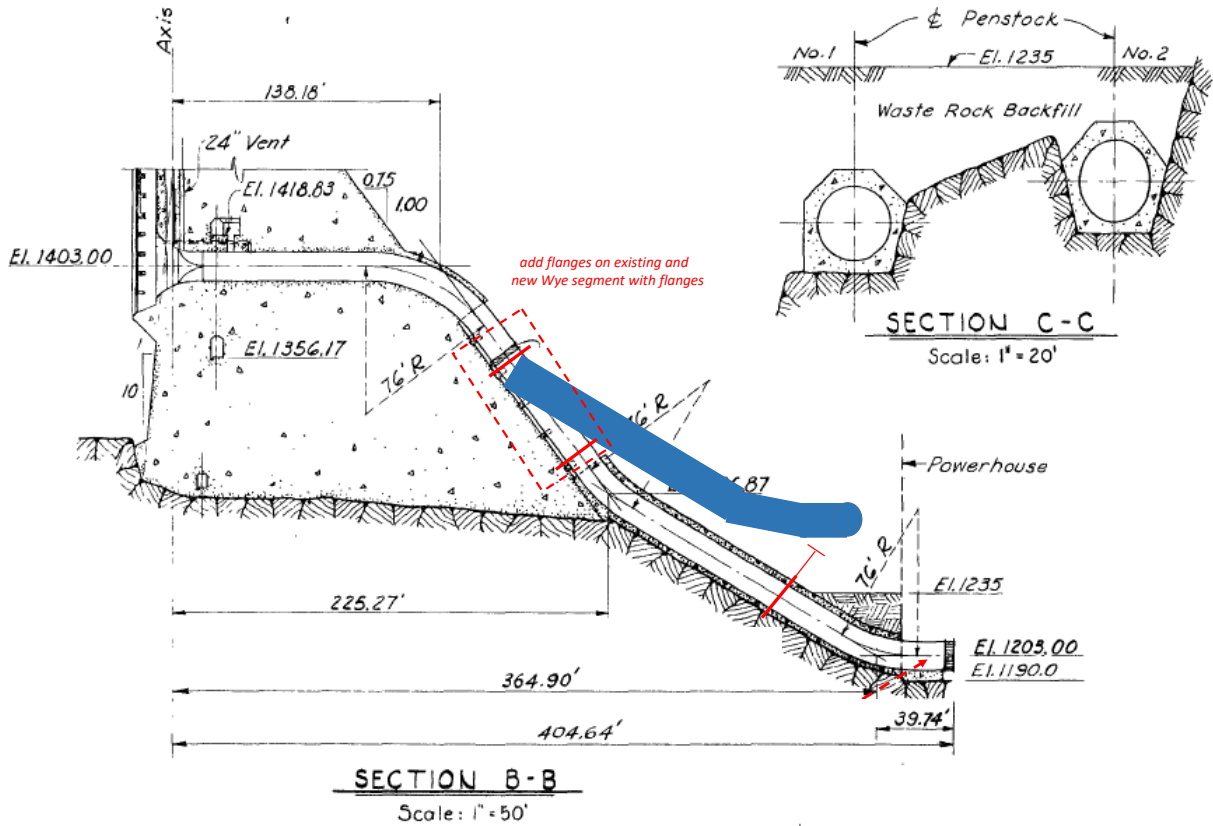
Schematic Elevation Details of the RO-Penstock Bifurcation Conduit
